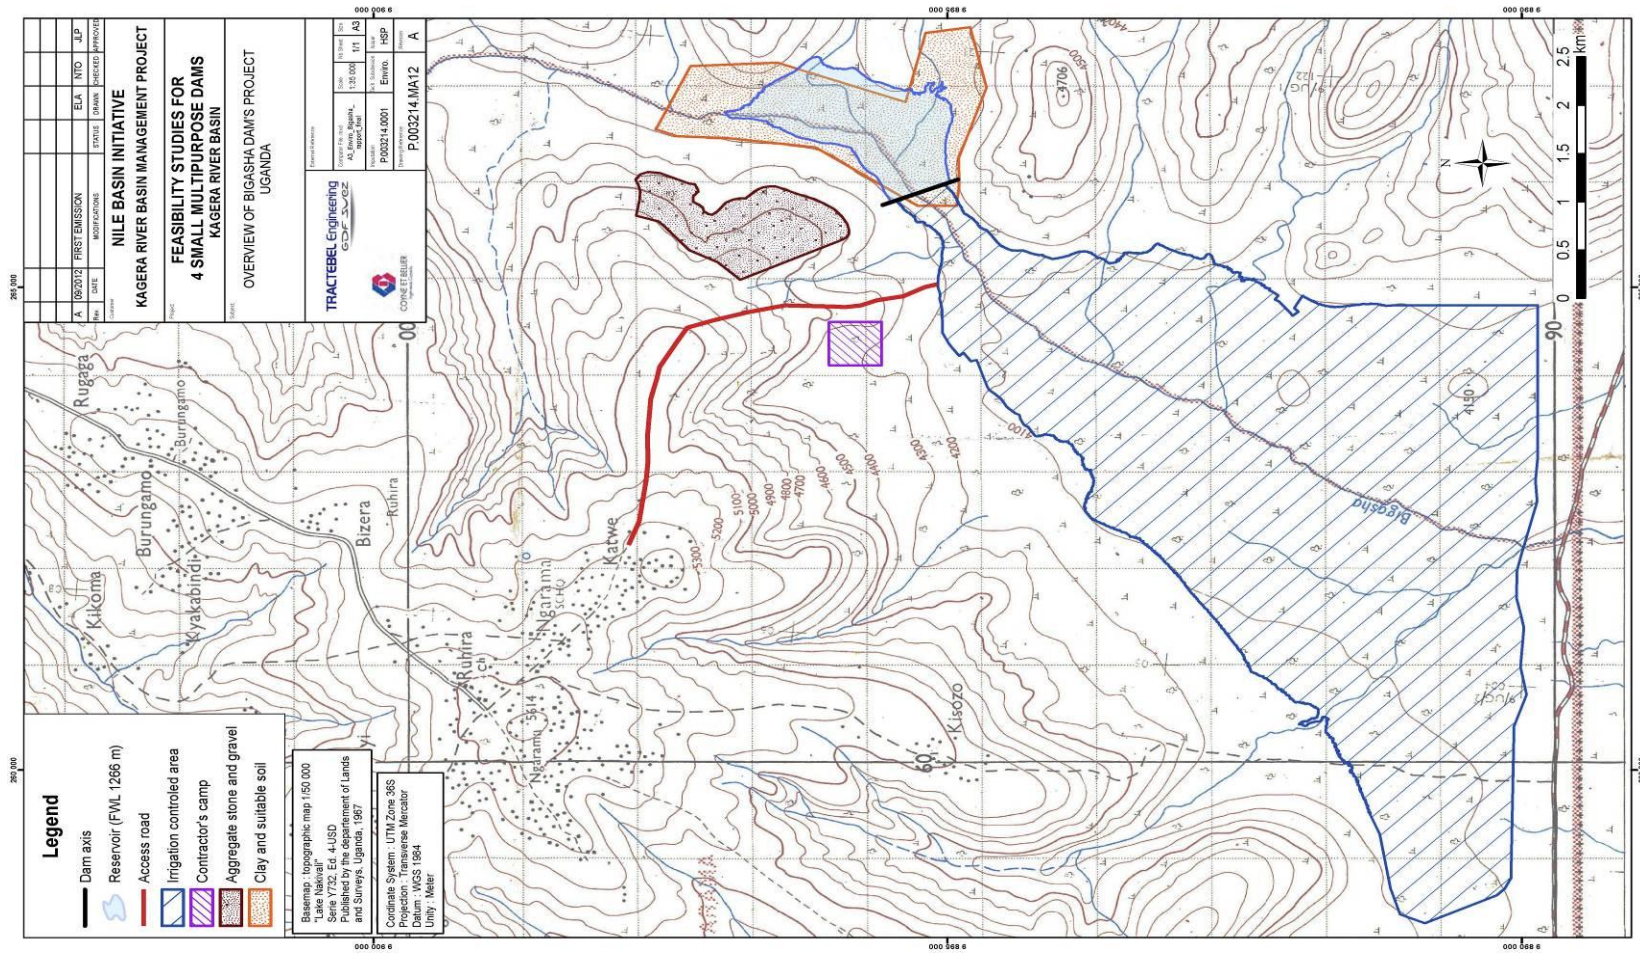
Bigasha Multipurpose Dam Project Layout
